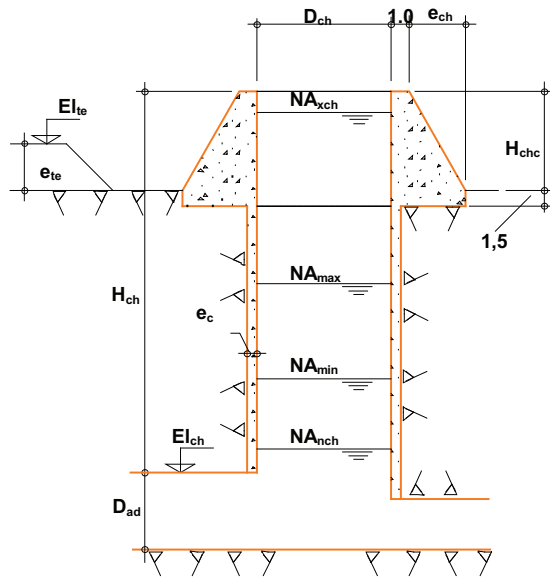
Typical cross-section of a surge tank with maximum oscillation exceeding the top of the bedrock.
